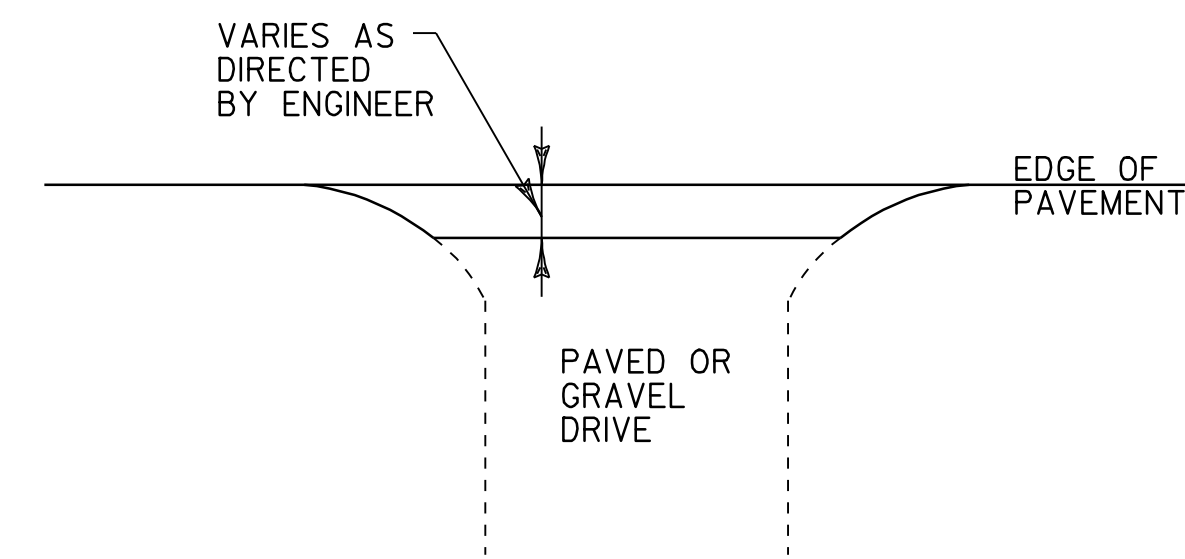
DETAIL AT VERTICAL COLD PLANE JOINTS
